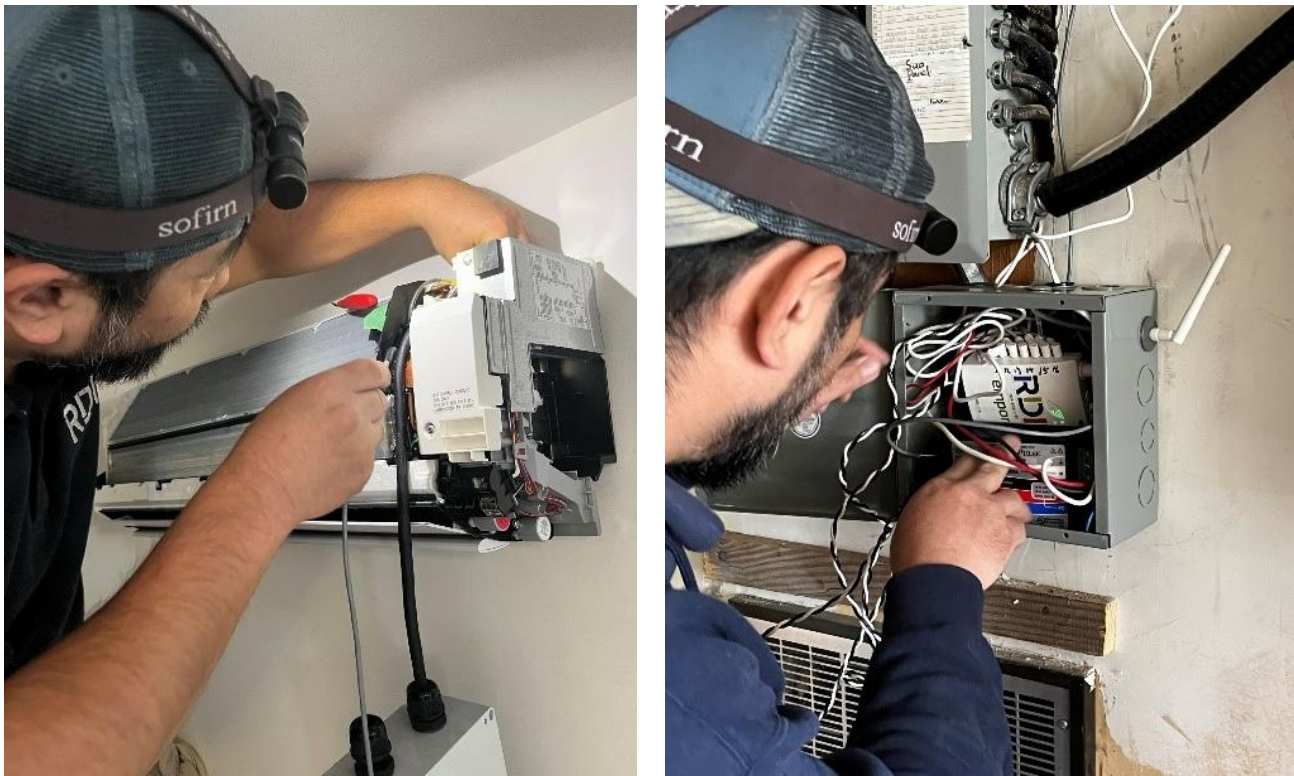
Installation of monitoring equipment at a mini-split indoor head (left) and at the electrical panel (right).
